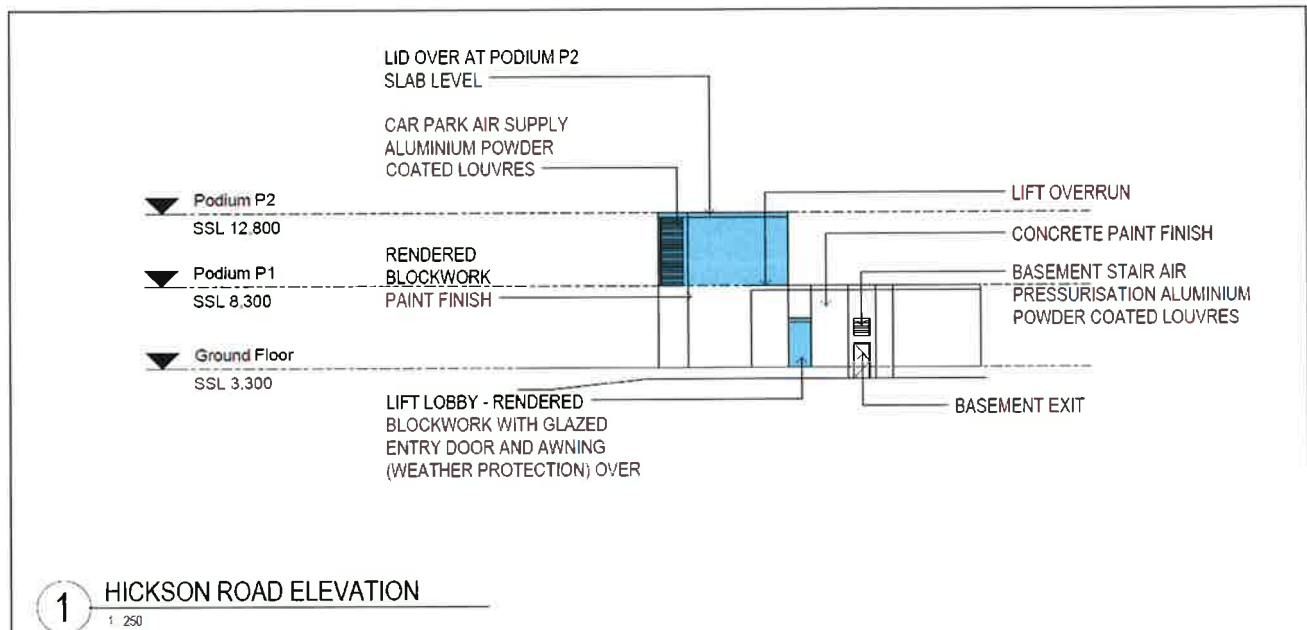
Example elevation of above ground structures when viewed from Hickson Road (Source: EIS)
